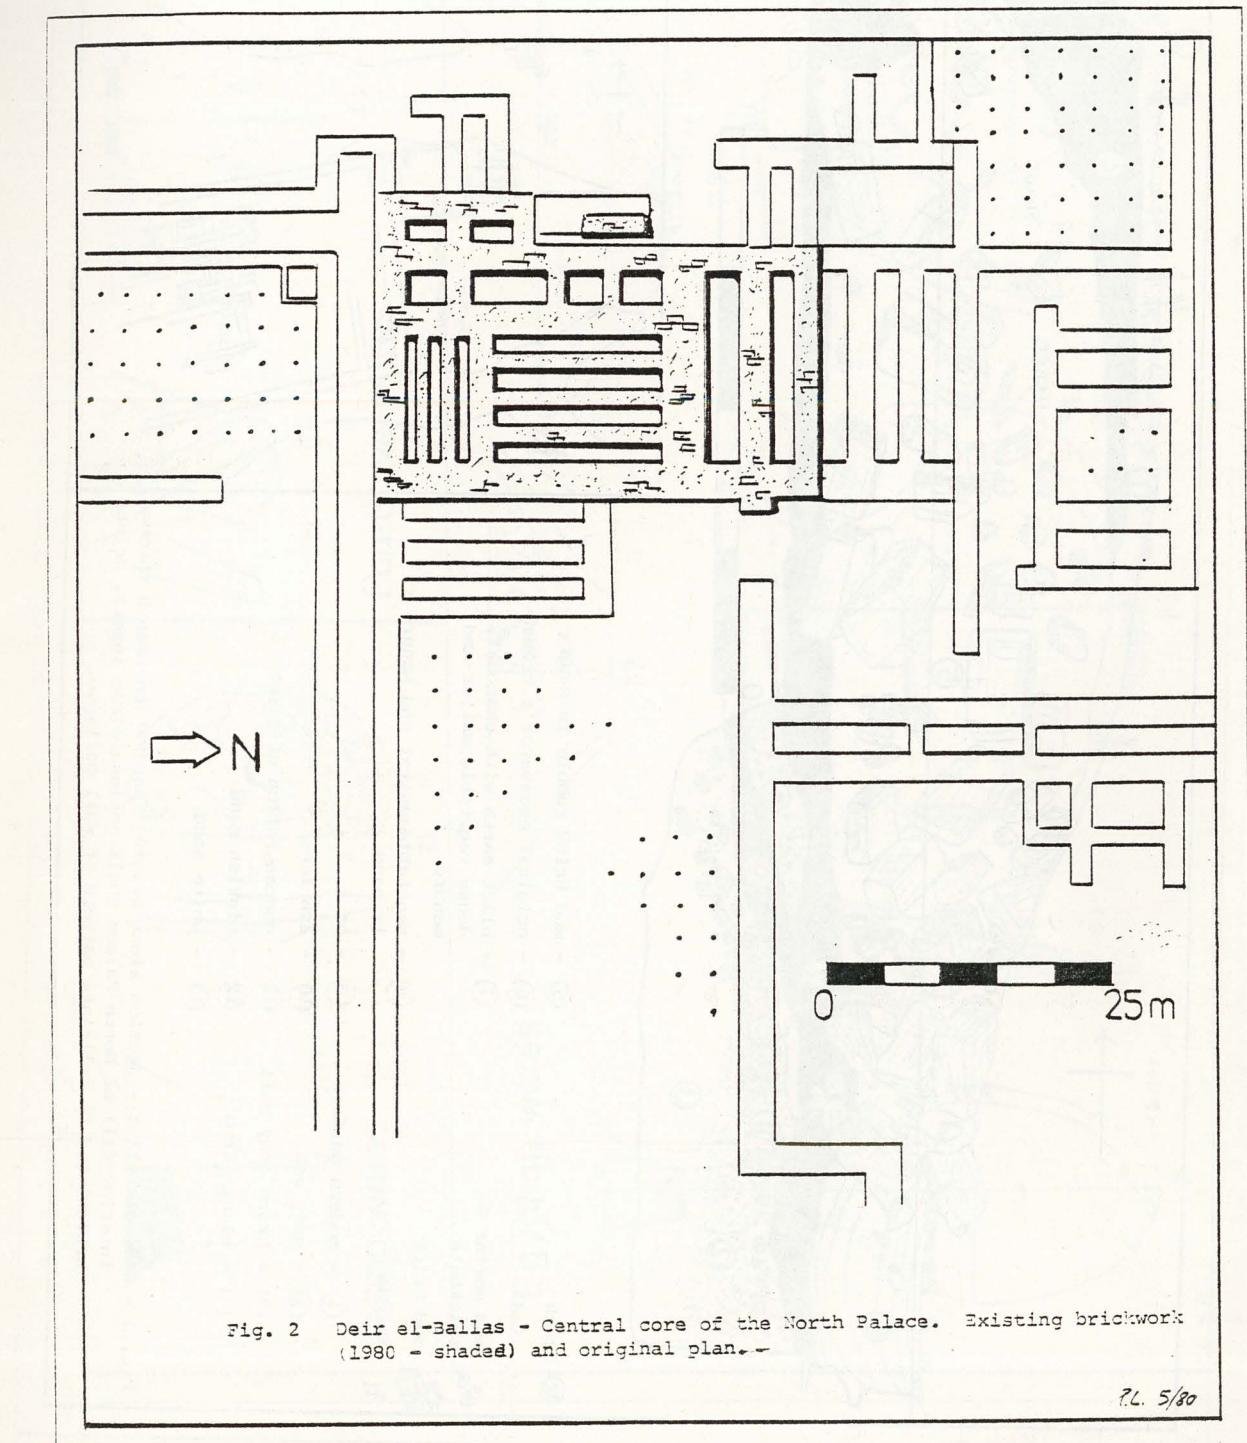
Deir el-Ballas - Central core of the North Palace. Existing brickwork (1980 - shaded) and original plan.
